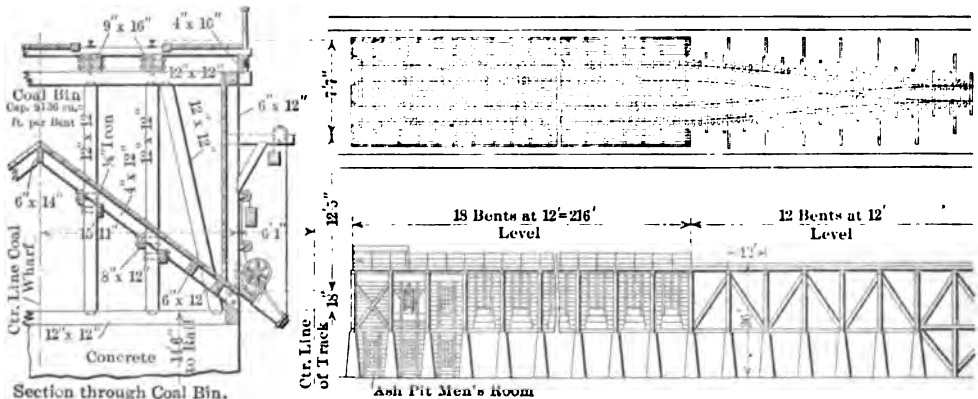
Coaling plant, East Altoona, Pa. —Pennsylvania Railroad.
